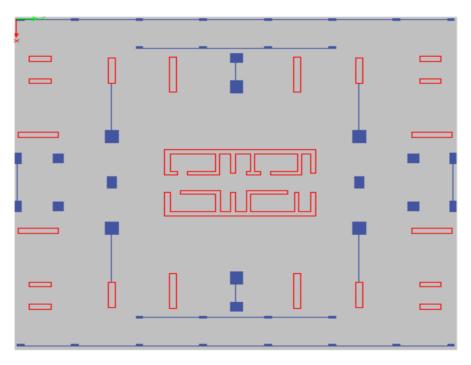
Figure: Final podiums floor plan (Sample: 1st Podium)
